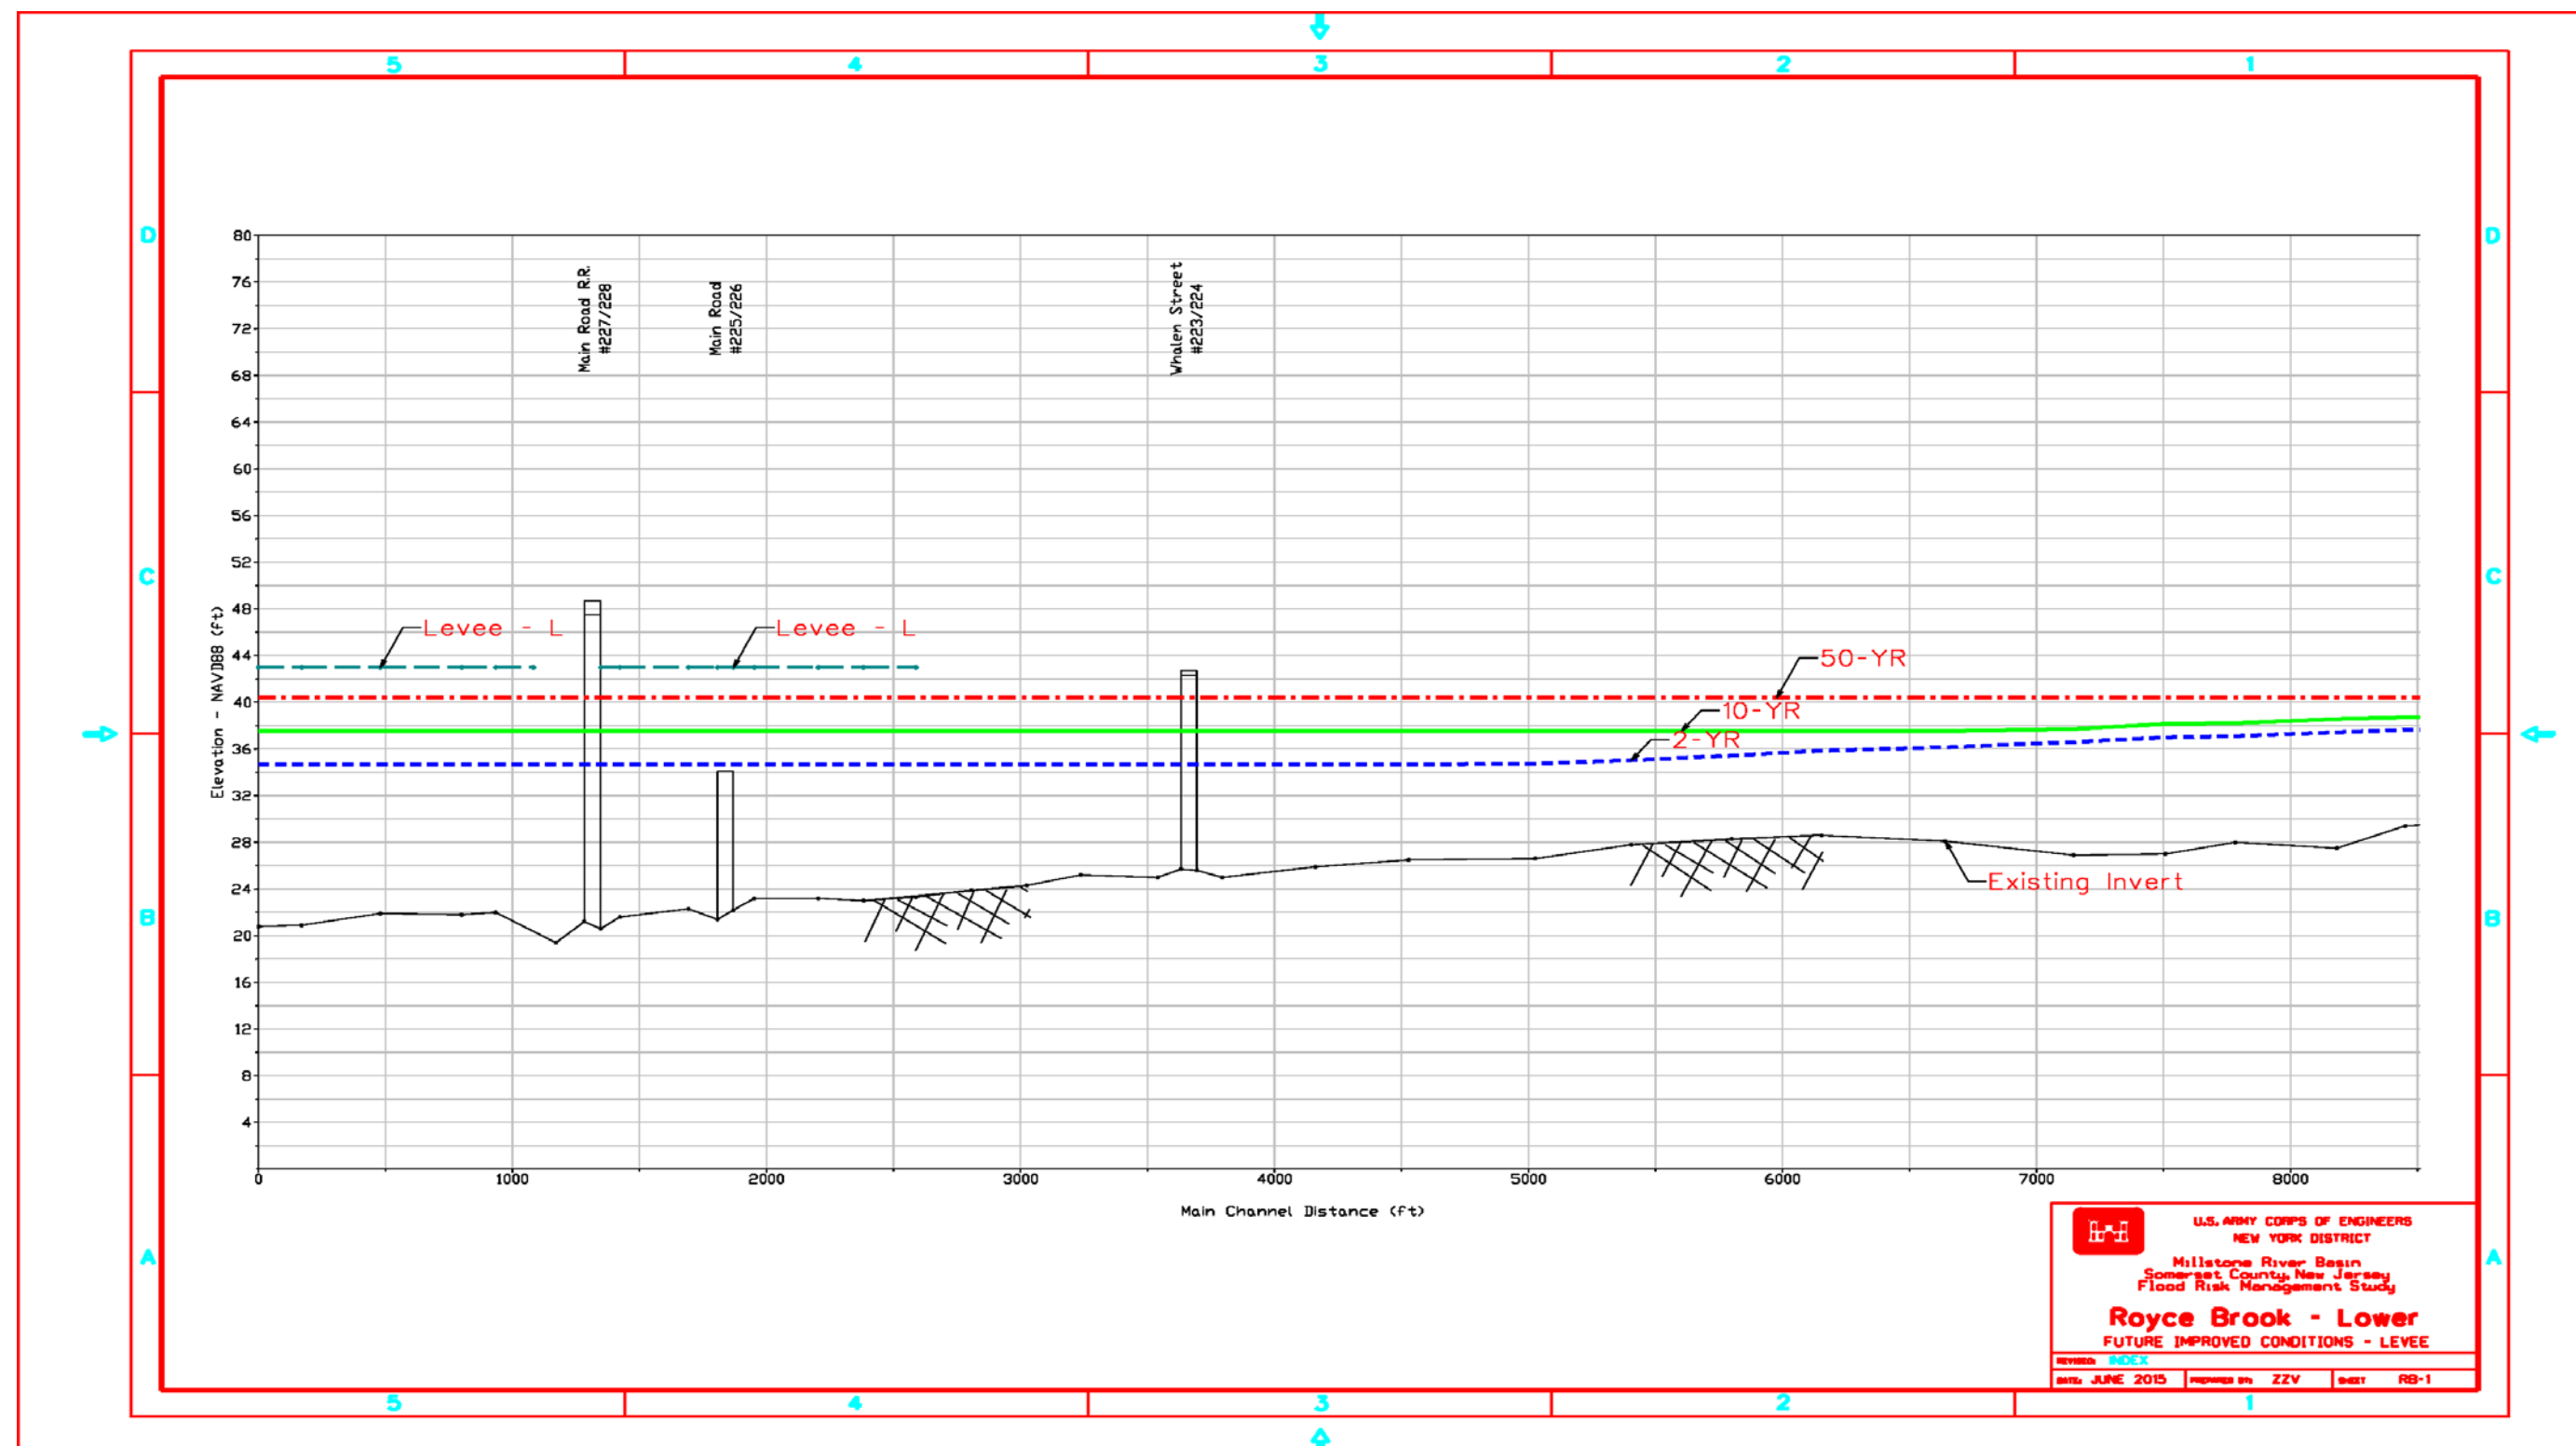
MAXIMUM WATER SURFACE PROFILE FOR LEVEE & FLOODWALL PLAN - FUTURE IMPROVED CONDITIONS (ROYCE BROOK)
